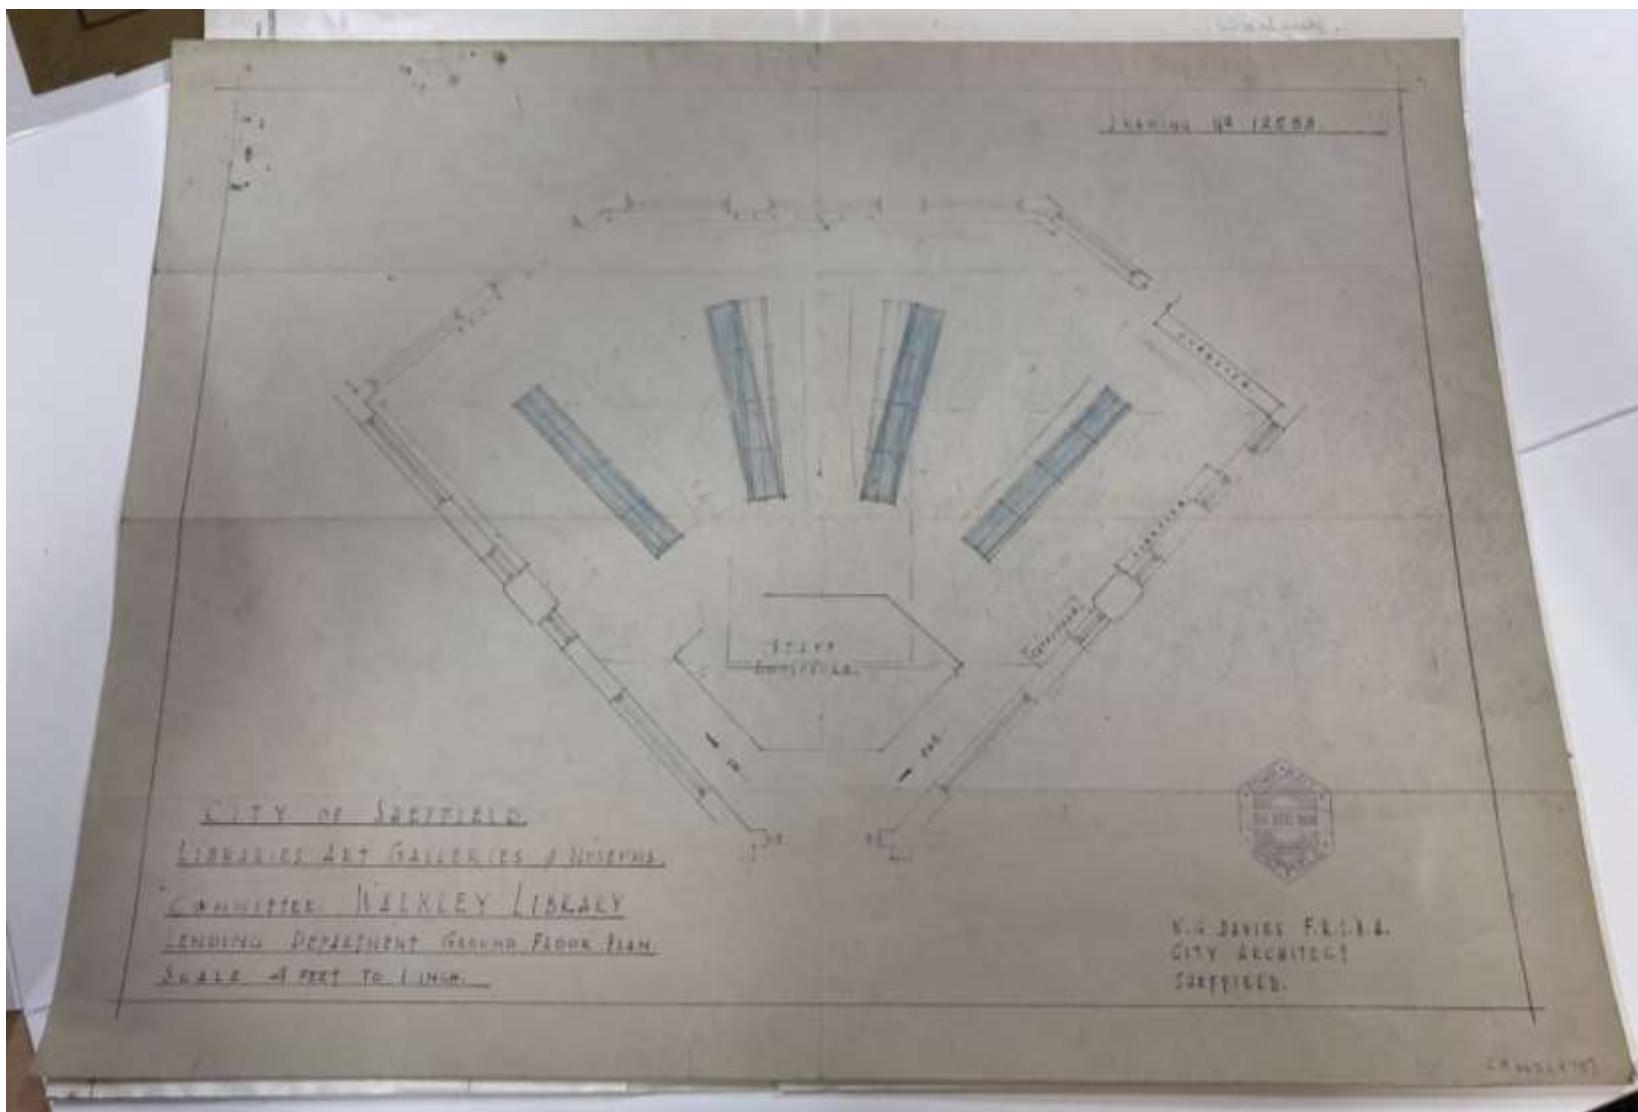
(22 Dec 1938). Walkley Library, Lending department ground floor plan. [Blueprint]. Walkley Library (CA663/34/2/275). Sheffield City Archives. Sheffield, England.
